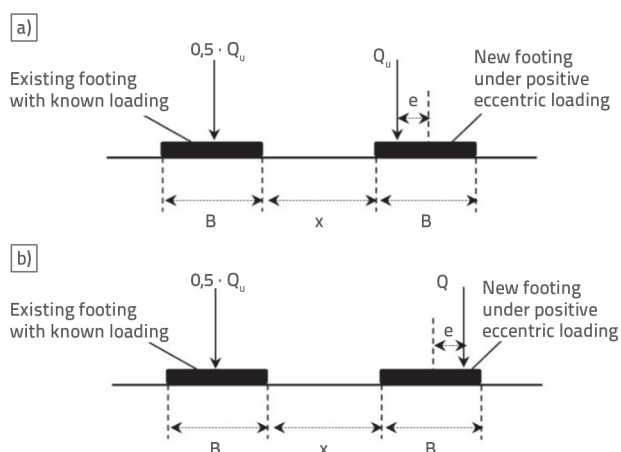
New footing subjected to eccentric loading adjacent to an existing footing: a) positive eccentricity (towards the existing footing); b) negative eccentricity (away from the existing footing)
